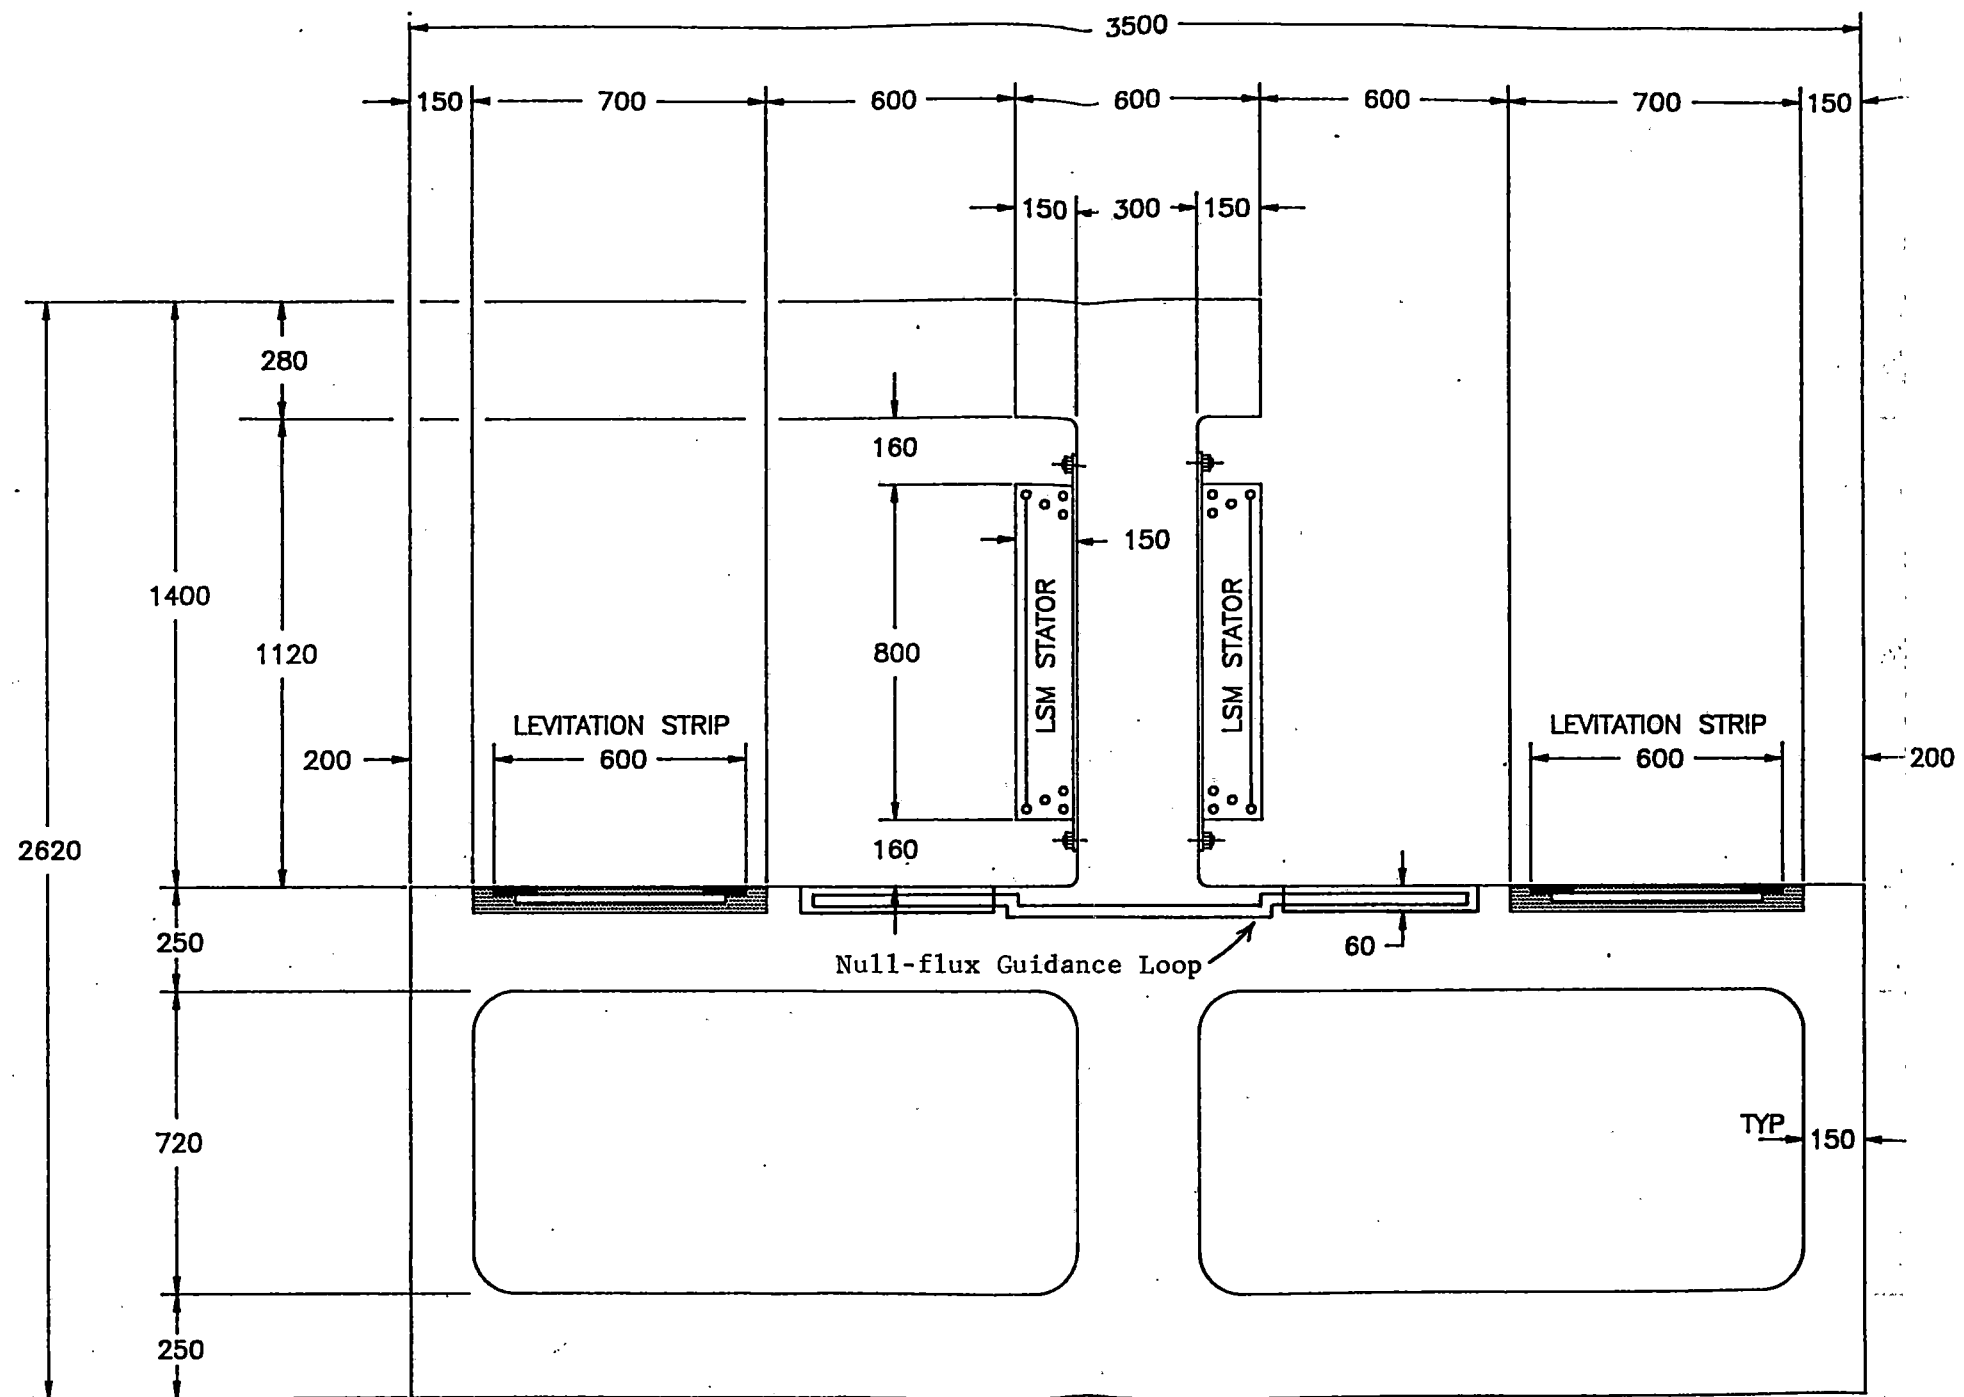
TYPE IX GUIDEWAY CROSS SECTION
